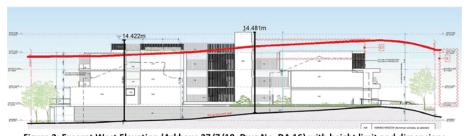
Excerpt West Elevation (Arkhaus 27/7/18, Dwg No. DA 16) with height limit and dimensions emphasised
